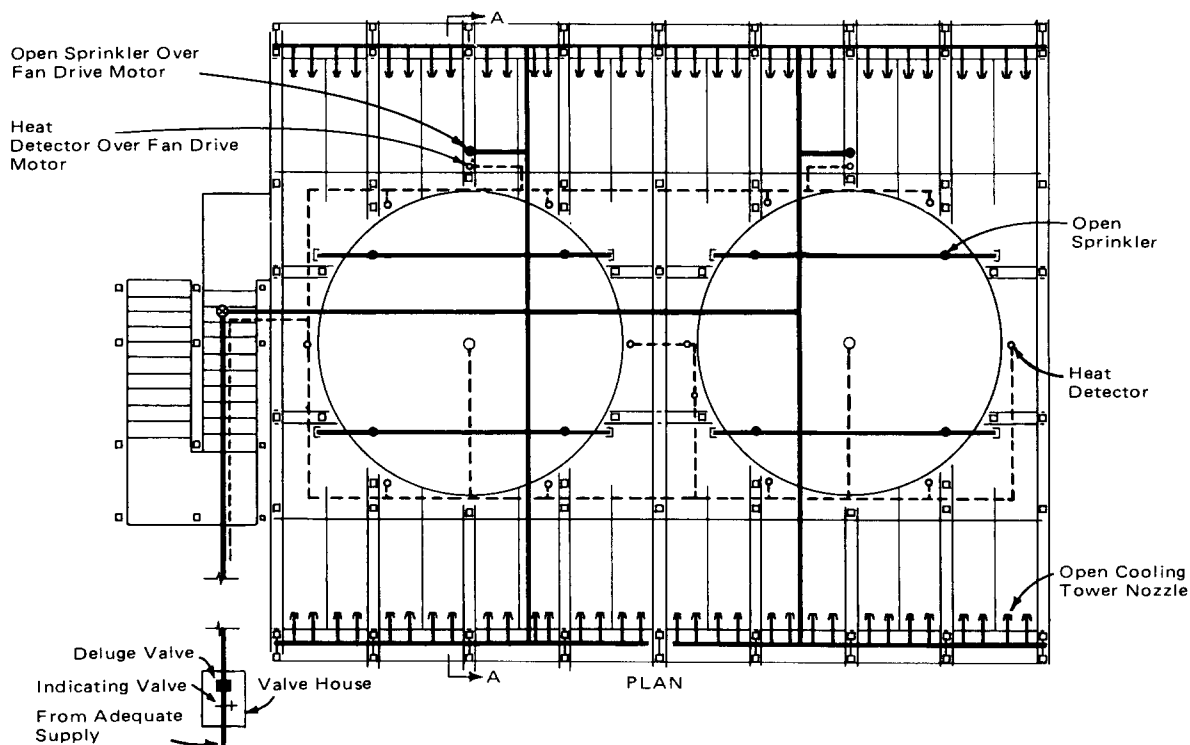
(c) Typical deluge fire protection arrangement for crossflow towers. [See Note following caption of Figure A-5-2.4.2(d).]
